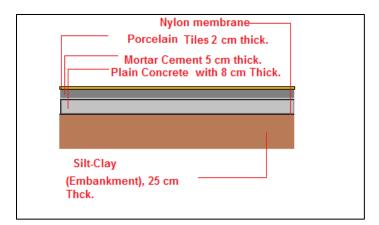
Section in the floor of Gullan & Harsham houses (Kareim, 2018)
